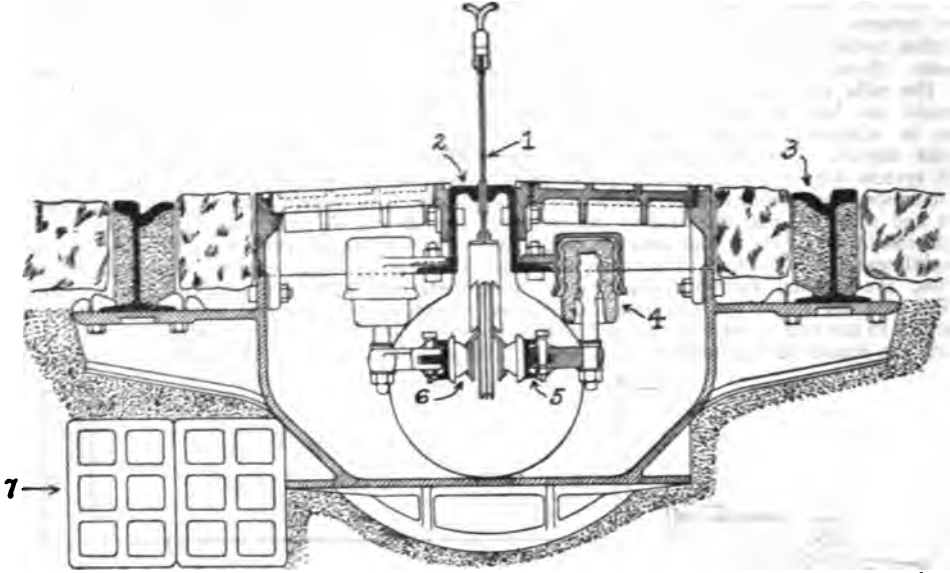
Typical cross-section of underground conduit construction. 1. Plow; 2. Slot rails; 3. Track rails; 4. Insulator; 5. Conductor; 6. Sliding contact on plow; 7. Conduit for feeders.
